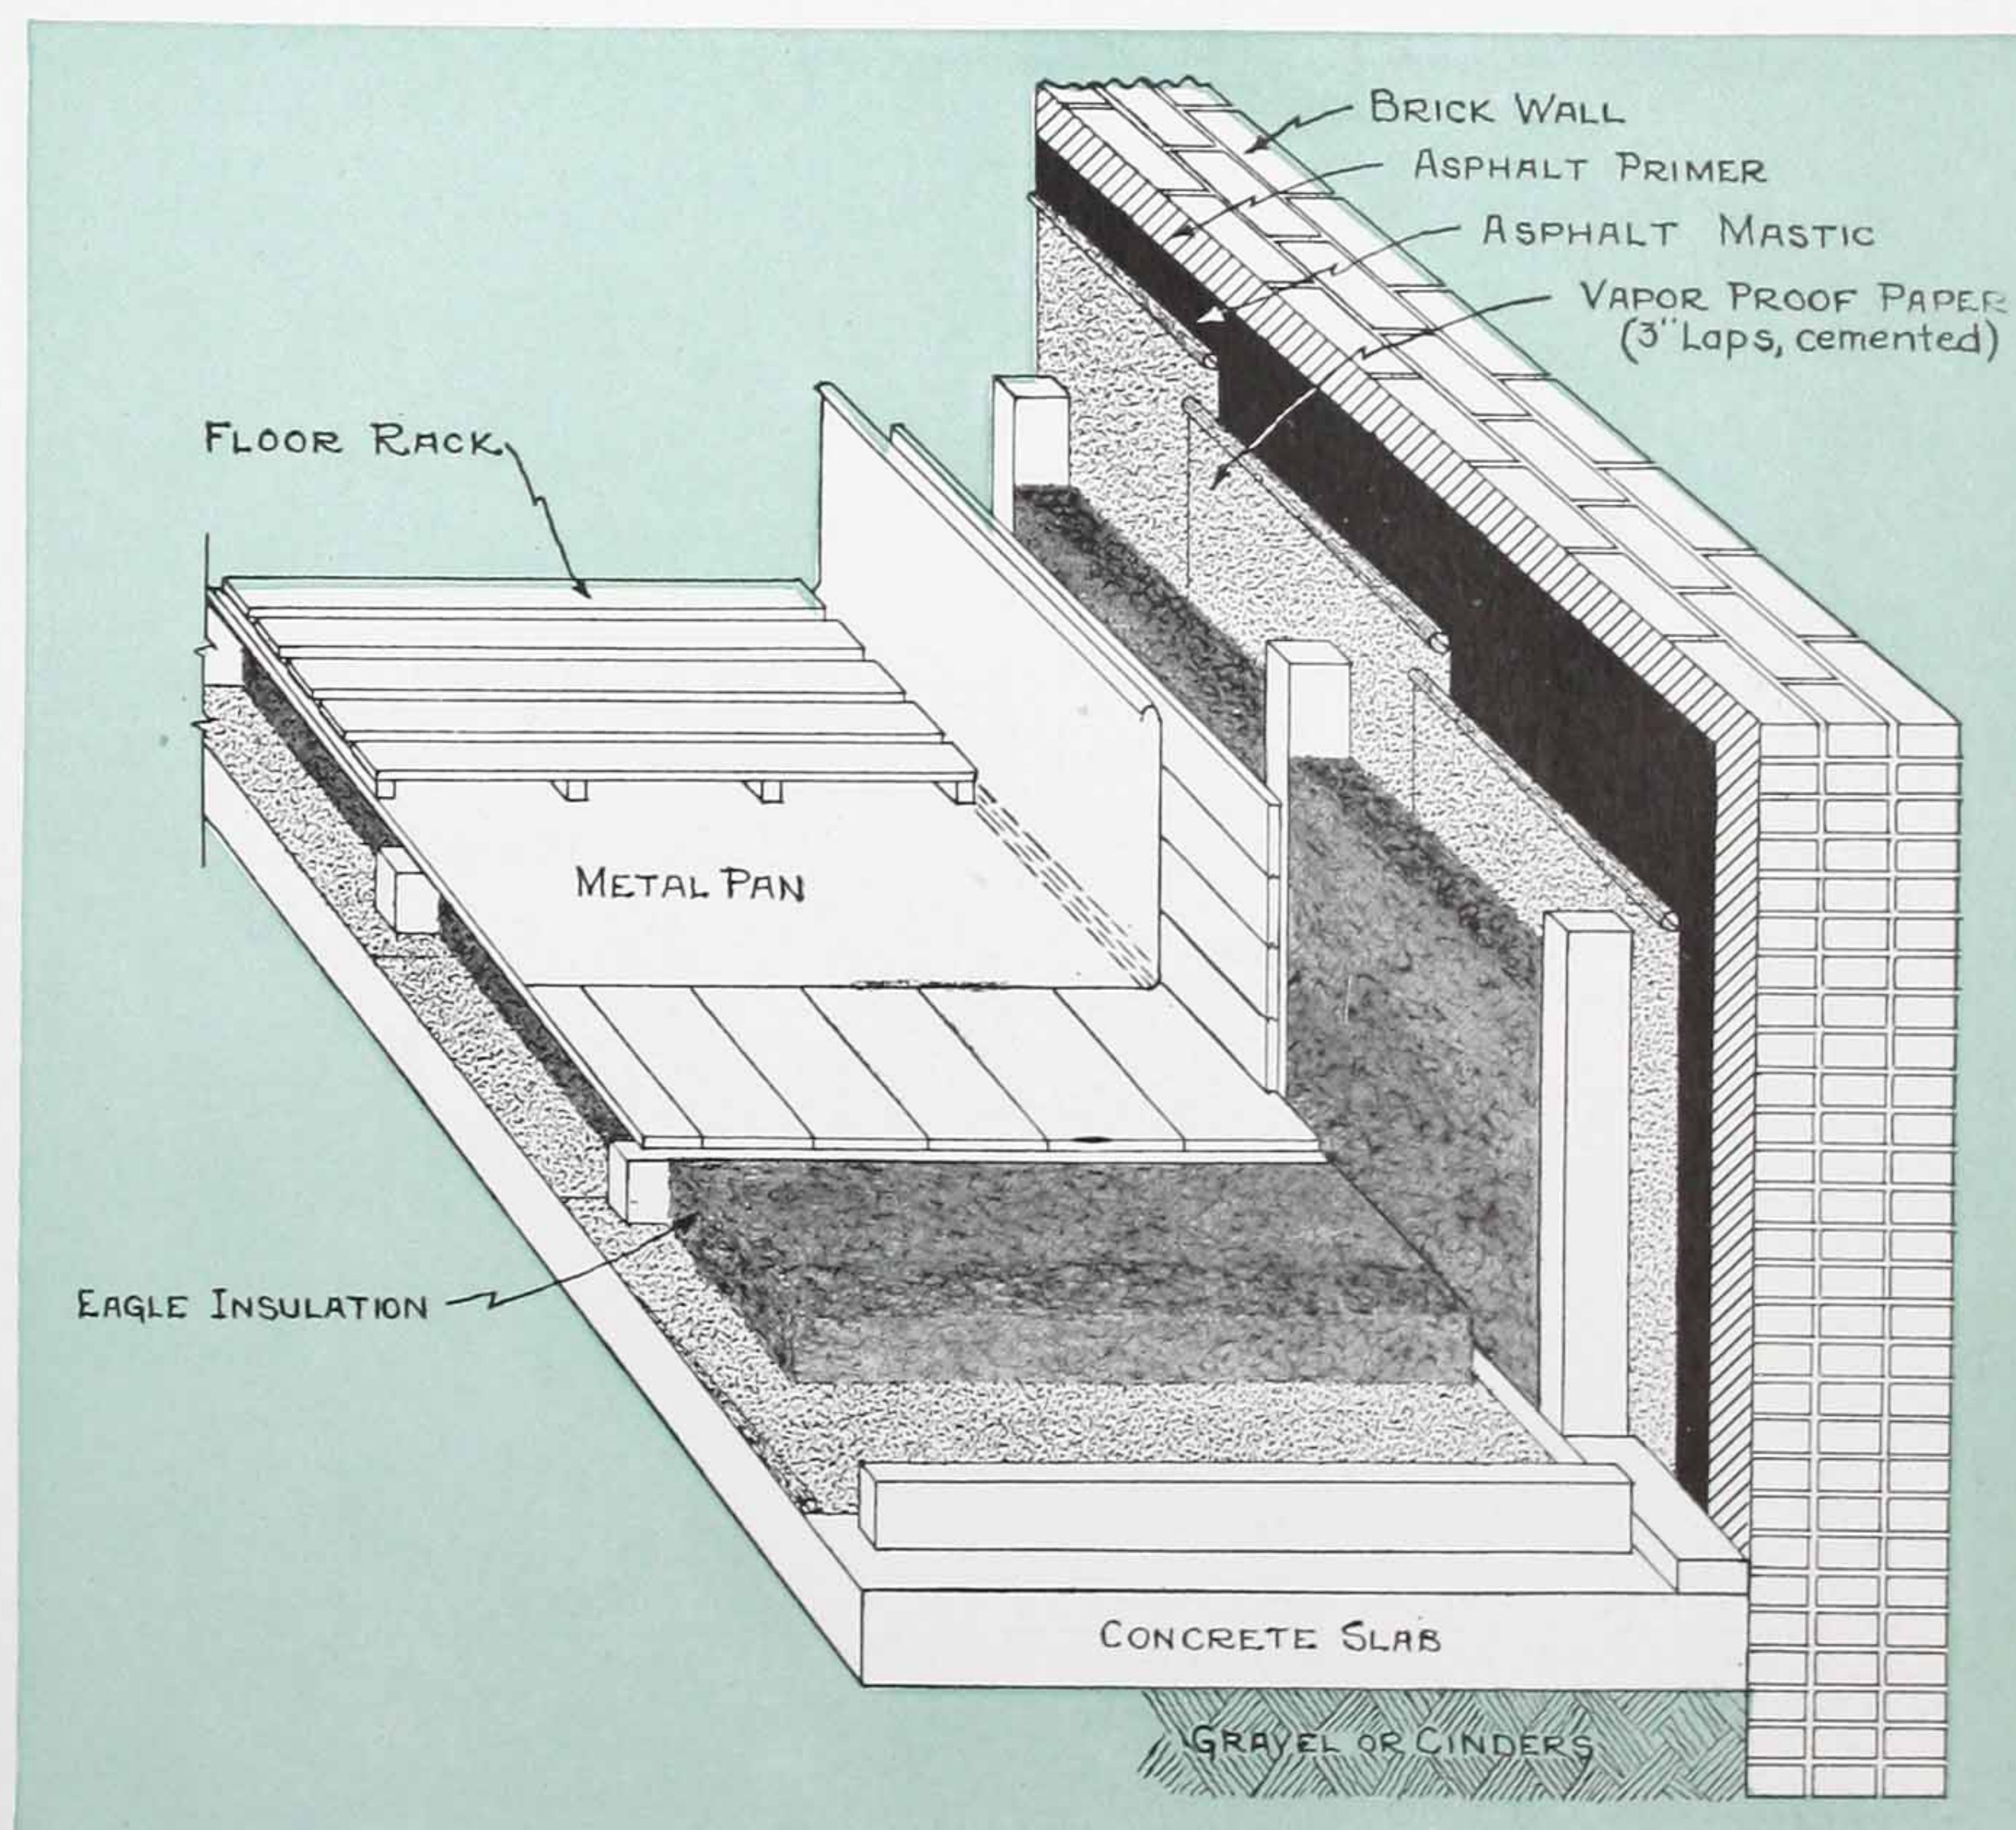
Heavy gauge galvanized copper bearing steel sheet recommended for wooden floors
